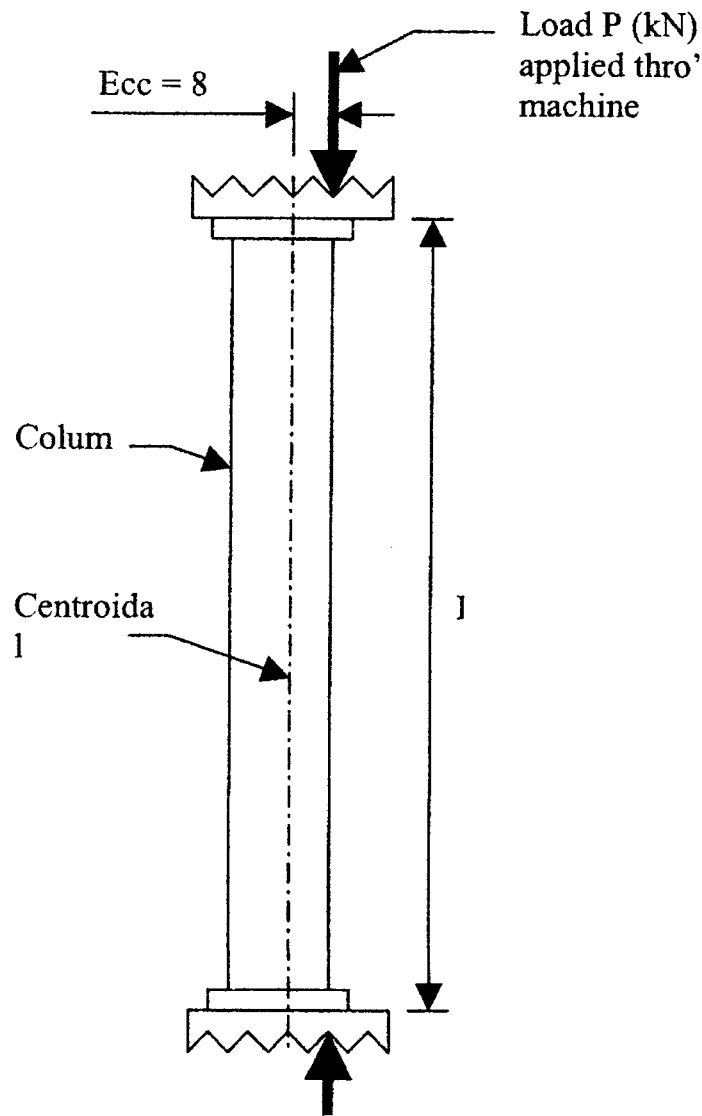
Schematic Diagram of Eccentrically Loaded Column Test
